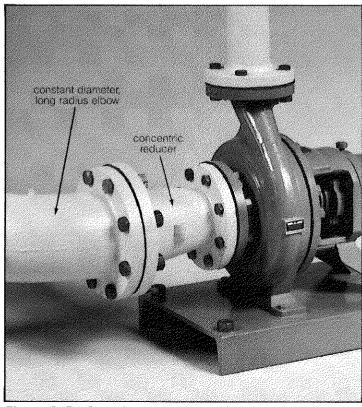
Preferred arrangement of reducer and long radius elbow on a single-suction pump when straight pipe approach cannot be provided.
